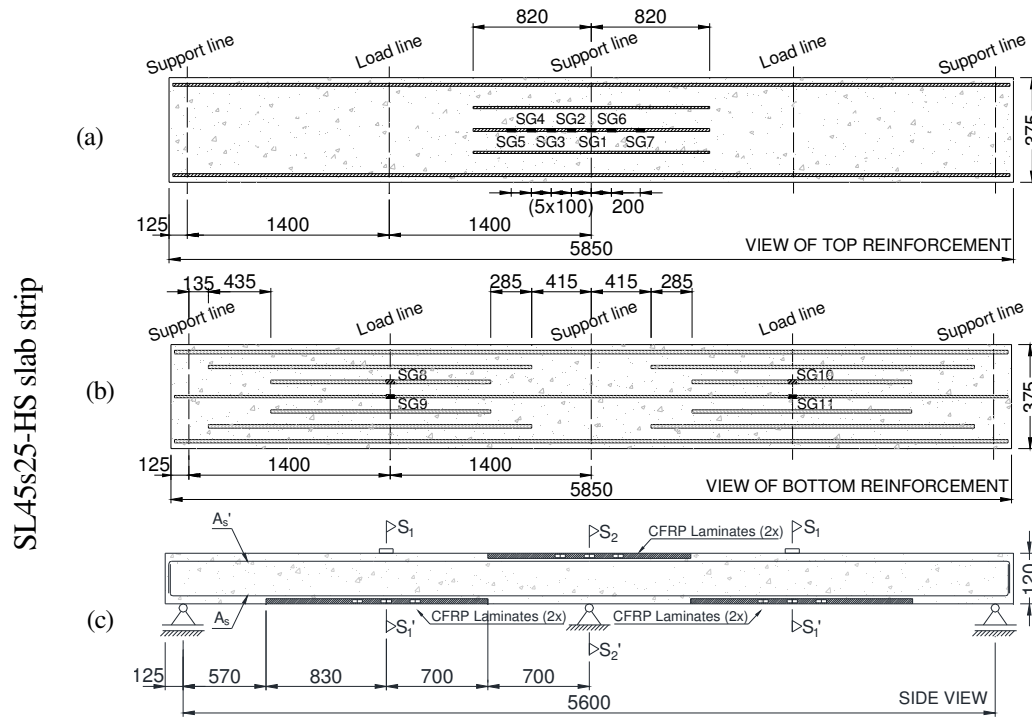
Arrangement of the (a-b) longitudinal steel reinforcement and (c) CFRP laminates of the SL45s25-HS slab strip.
